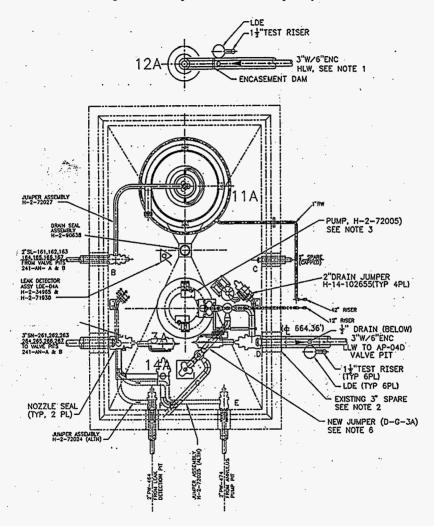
Proposed AN-01A Proposed Jumper Layout.
